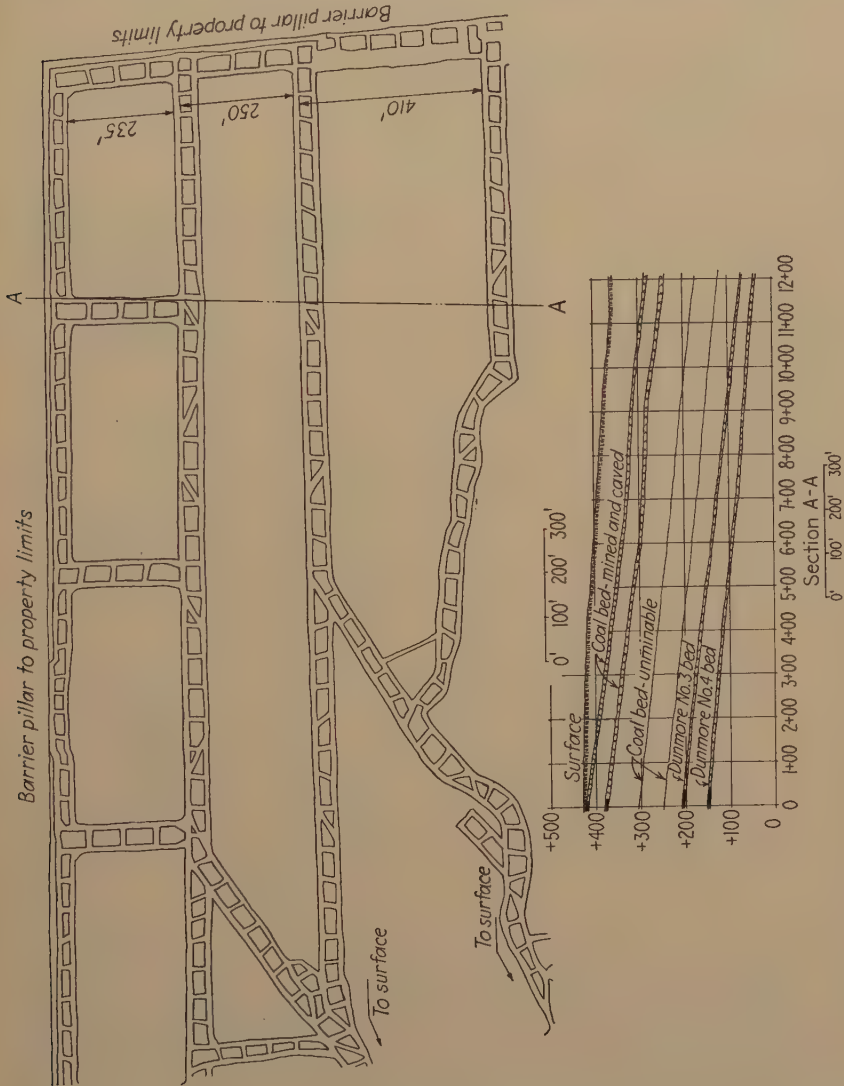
PLAN OF MINE WORKINGS USING SHAKING CONVEYOR AND COLLAPSIBLE STEEL PROPS.
